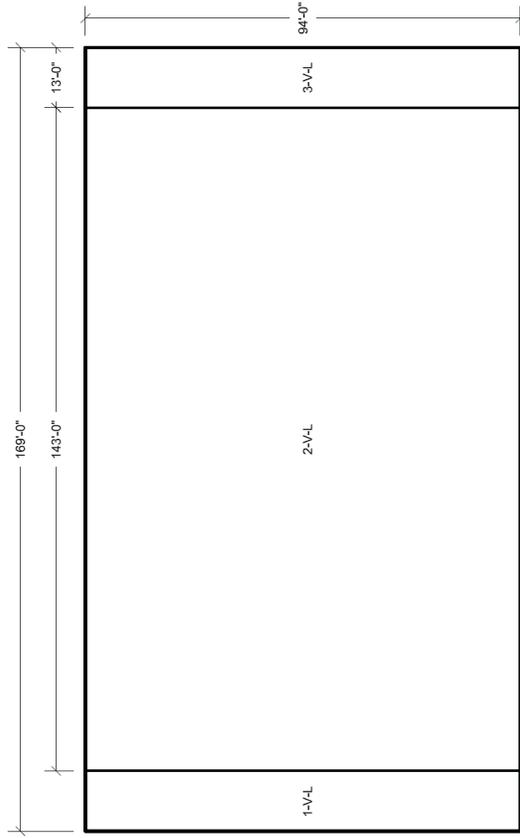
H.6-126: PUMP HOUSE FOUNDATION MAT
